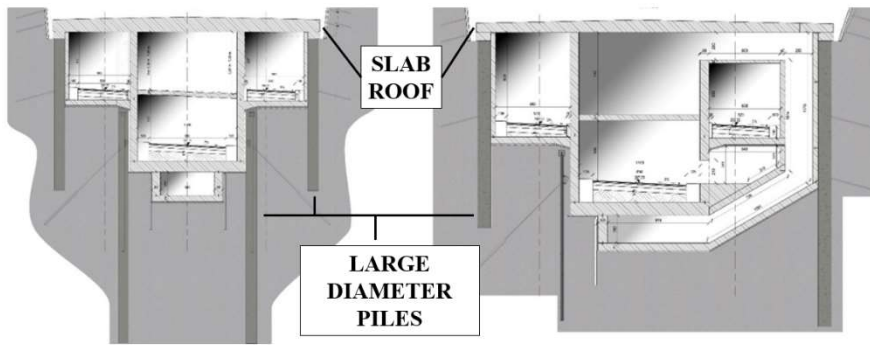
C&C tunnel typical section and section across the ventilation duct (Barovero et al. 2023a, modified by the authors).
